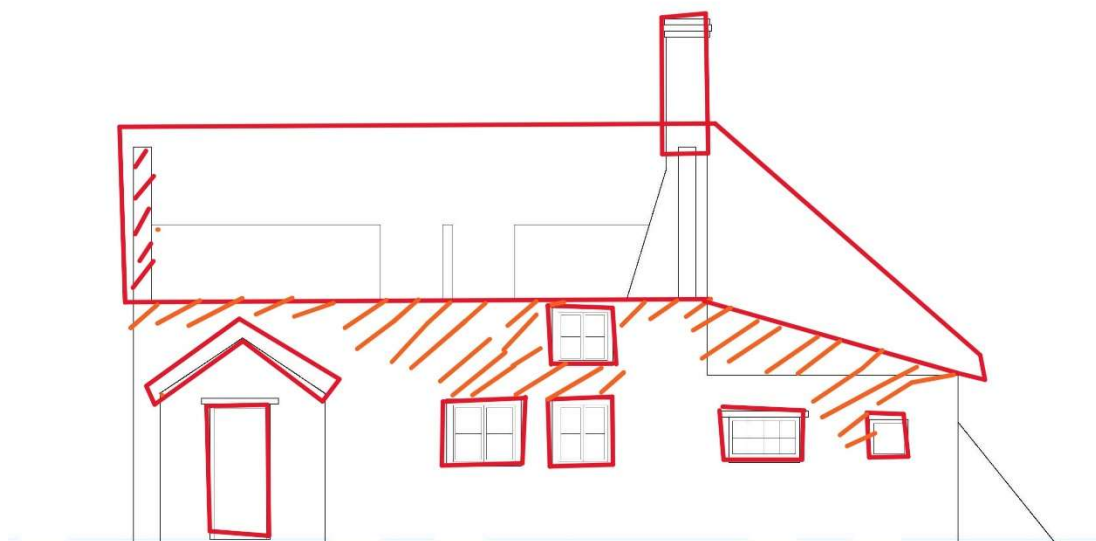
Existing North Elevation – repair (orange) or reinstate to replicate pre-fire (red)
